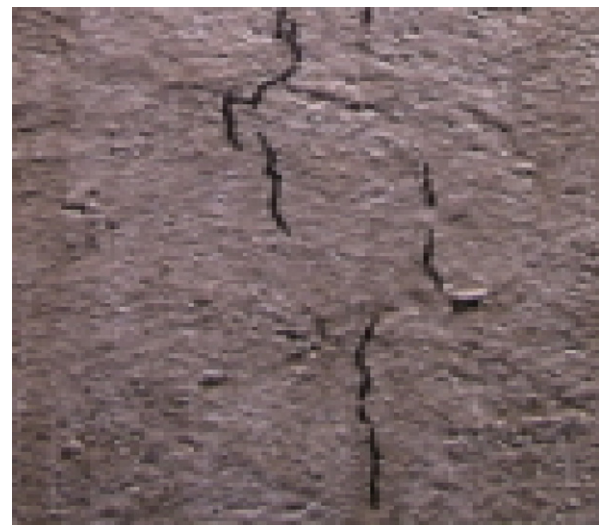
Secondary crack observed in steel–glass hybrid concrete (HSGL5) slab (area 52×52 mm).
